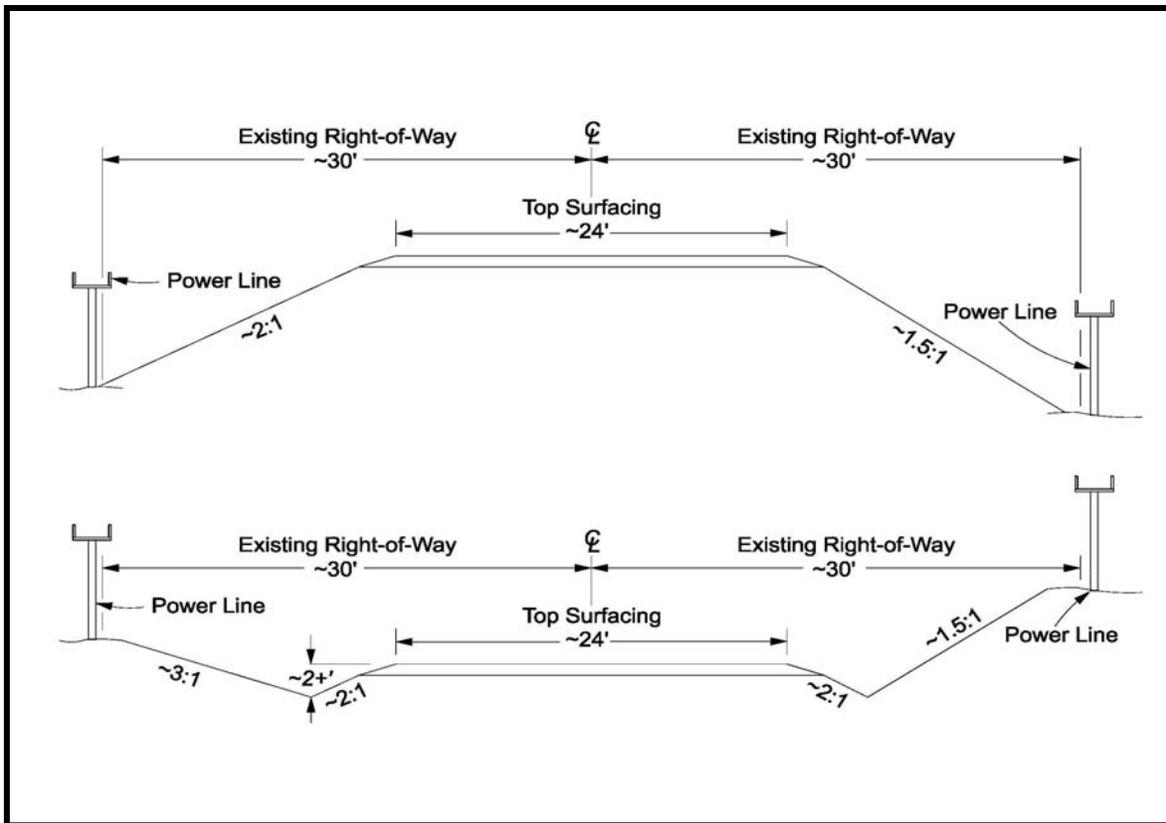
Representative Cut and Fill Sections of the Paved Section North of York Road
